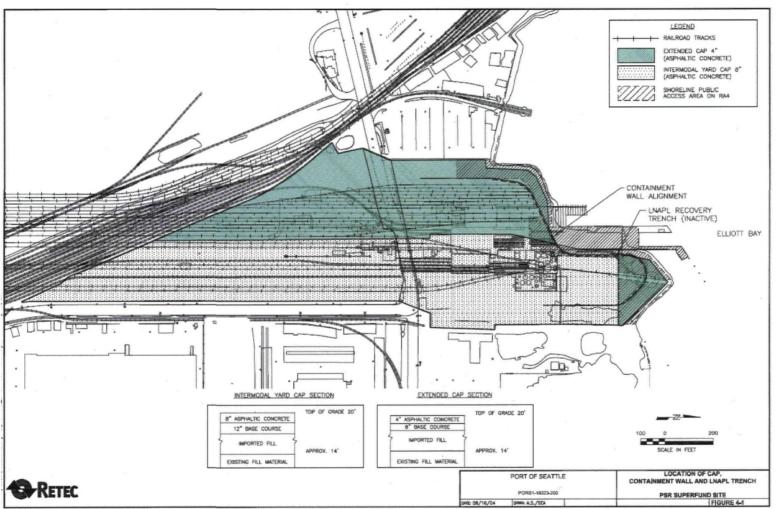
Location of the cap, slurry wall and LNAPL collection trench. Note that site features such as old tank farm and buildings indicated on this drawing no longer exist on site.
